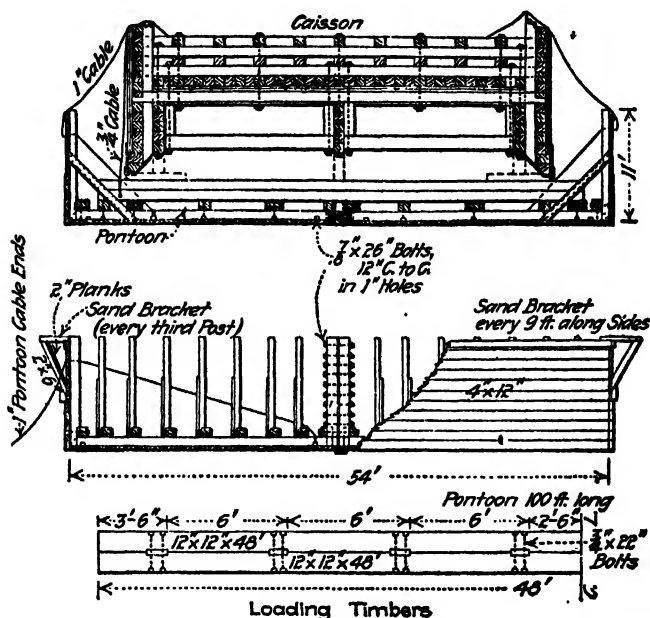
Caisson-Launching Pontoon, New Memphis Bridge.
